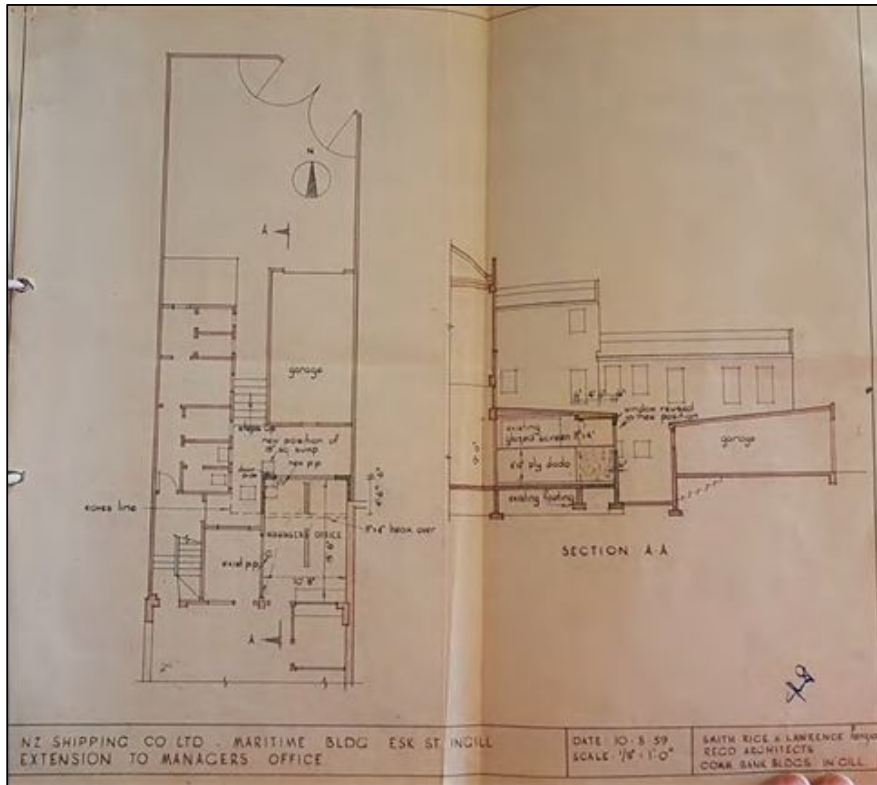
Plans showing 1959 alterations to 10 Esk Street.
